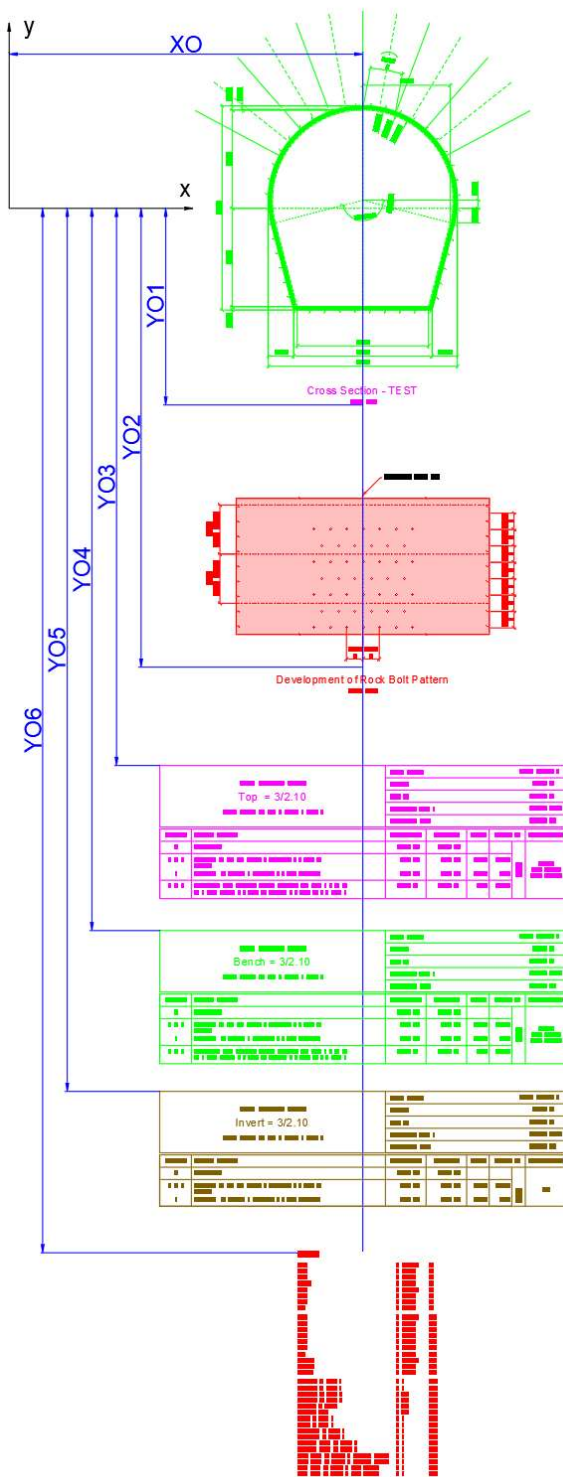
AUSTRIA ADD-ON layout (separted table style)
